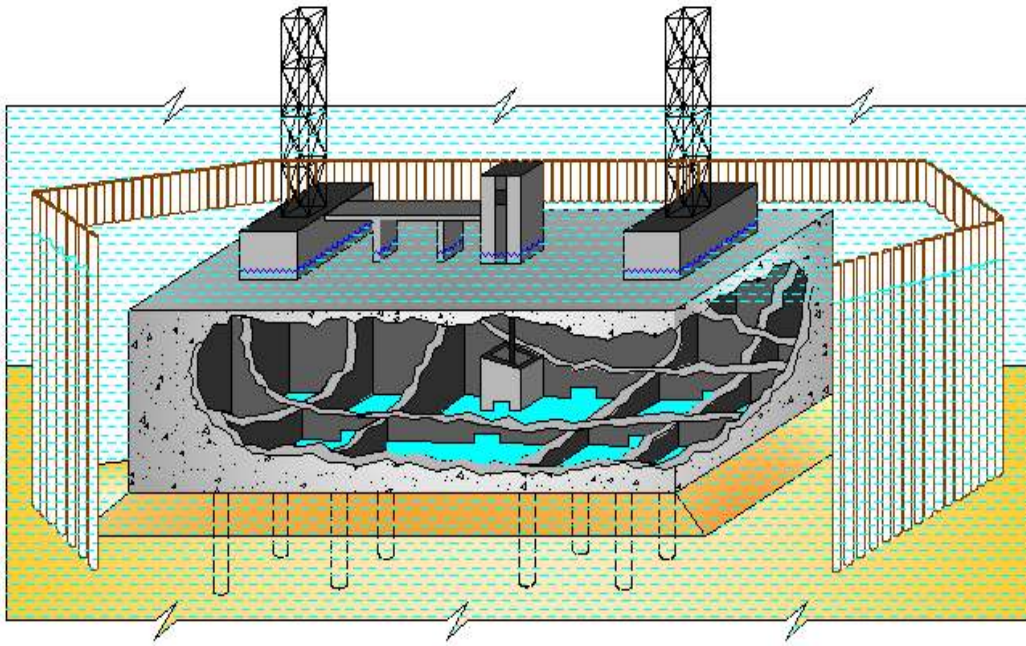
Breakaway diagram of main span, buoyant footings with timber, pier protection and tension pile anchors.
